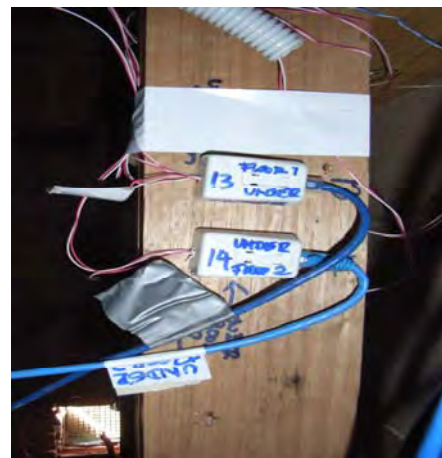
Krone connectors fixed to the floor joist connecting data cable to bell wire
